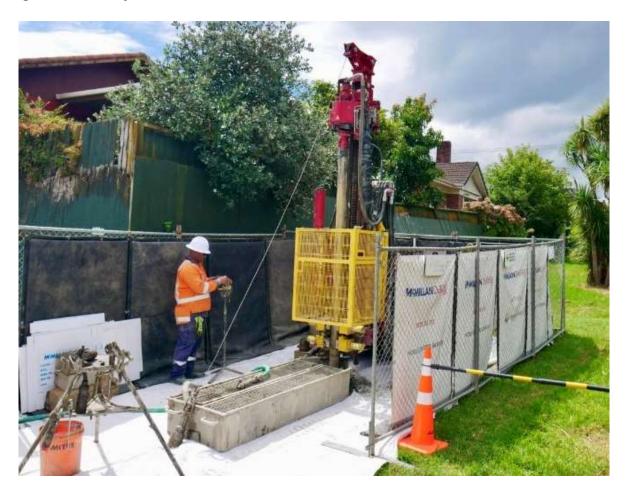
Drill Rig with layout showing temporary fencing, drilling pit and geotextile on ground
